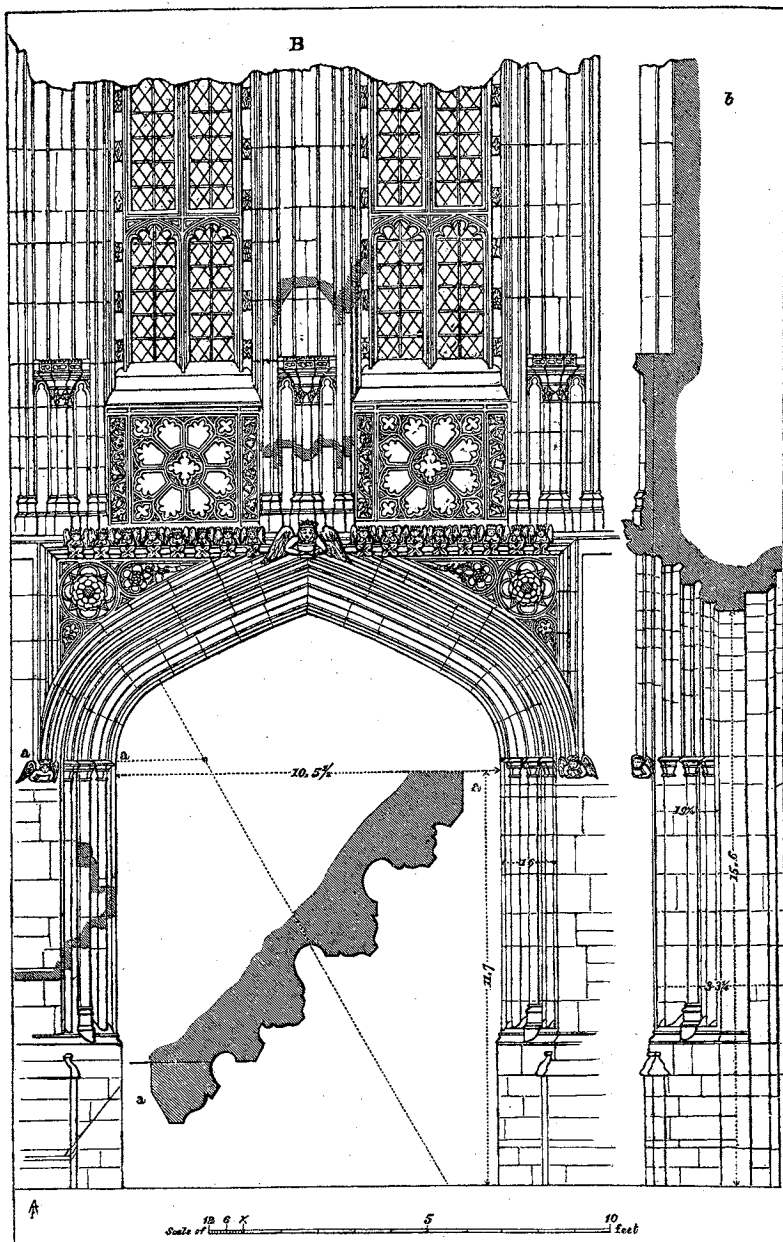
Cambridge, King's College Old Gateway. Outside.
